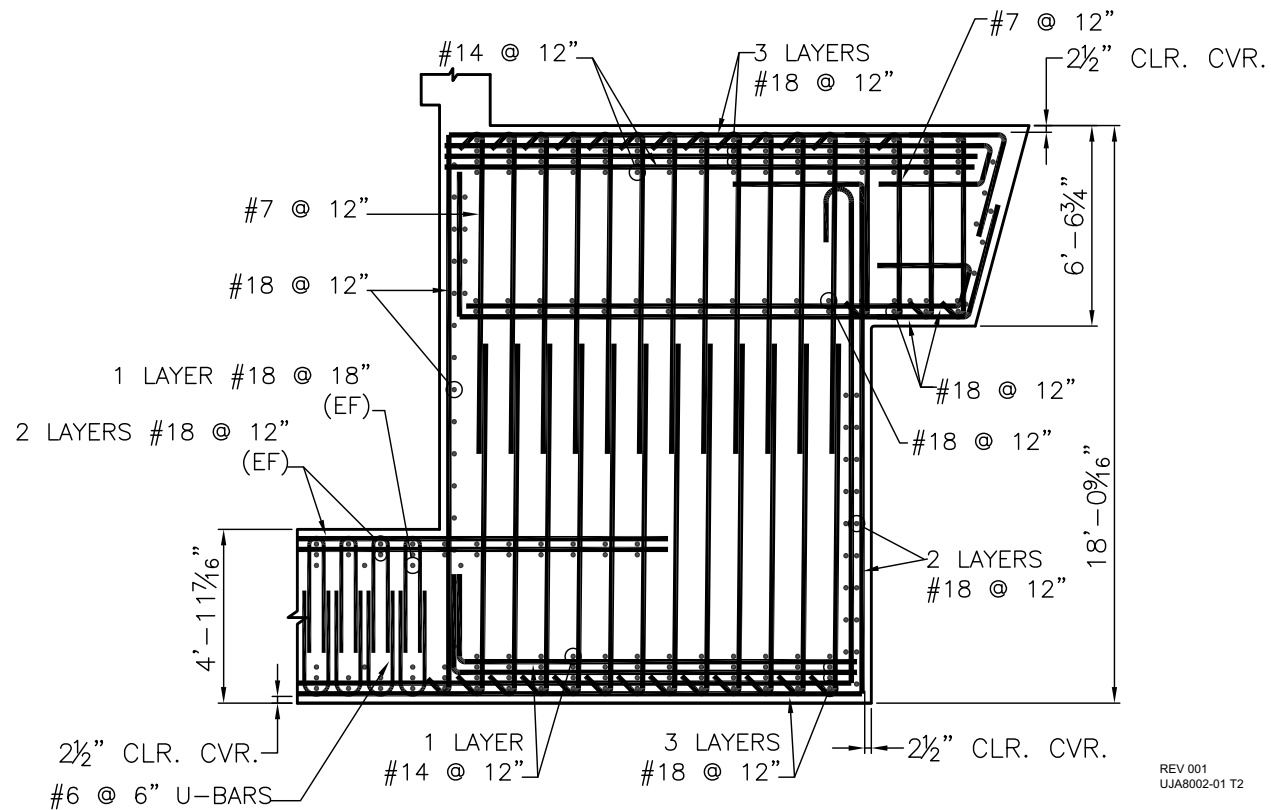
E.1-76—Reinforcement Pattern for NI Foundation Base Mat below RCB
